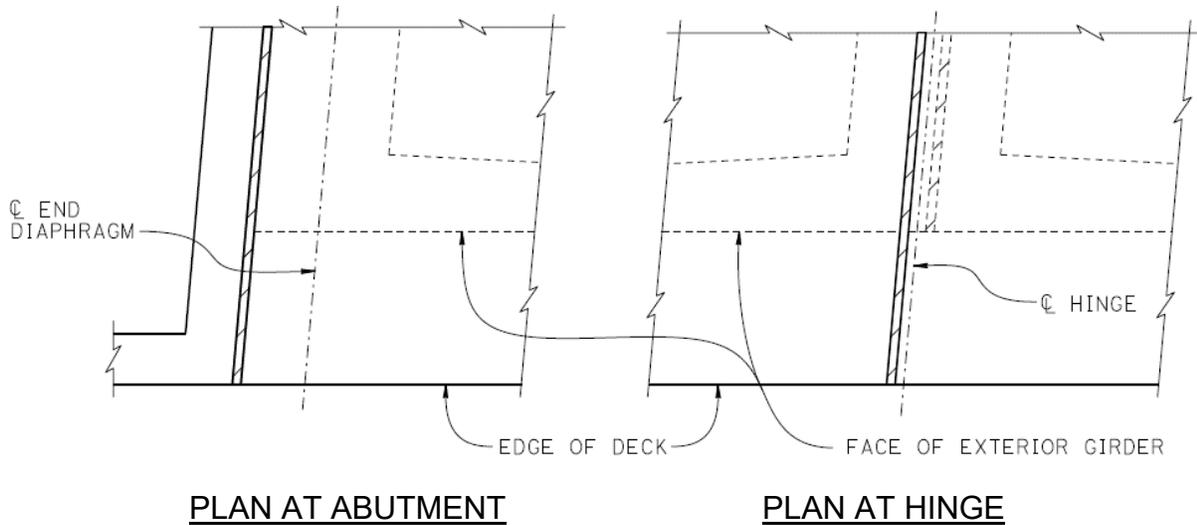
Deck Joints at Vertical or Sloping Exterior Girders (Skew 0° to 20°)
